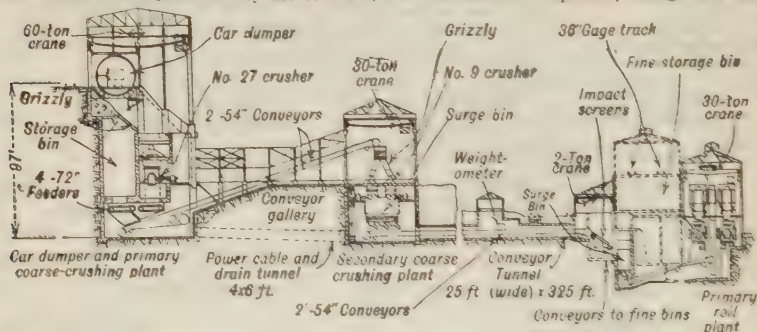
Coarse-crushing plant, Utah Copper Co., Magna mill.
